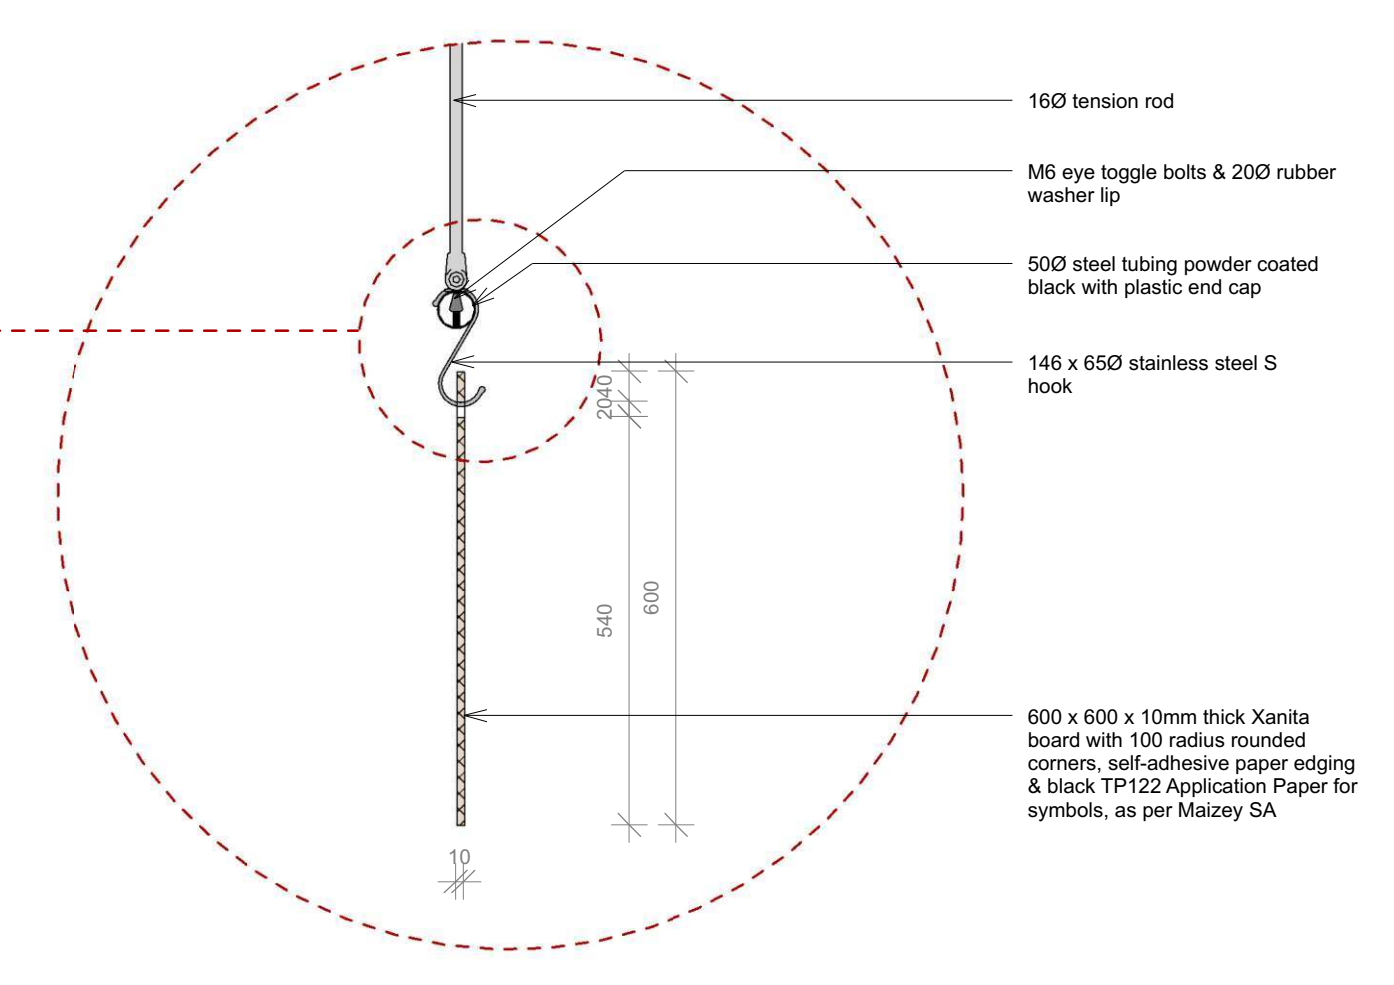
SUSPENDED CEILING AXONOMETRIC
